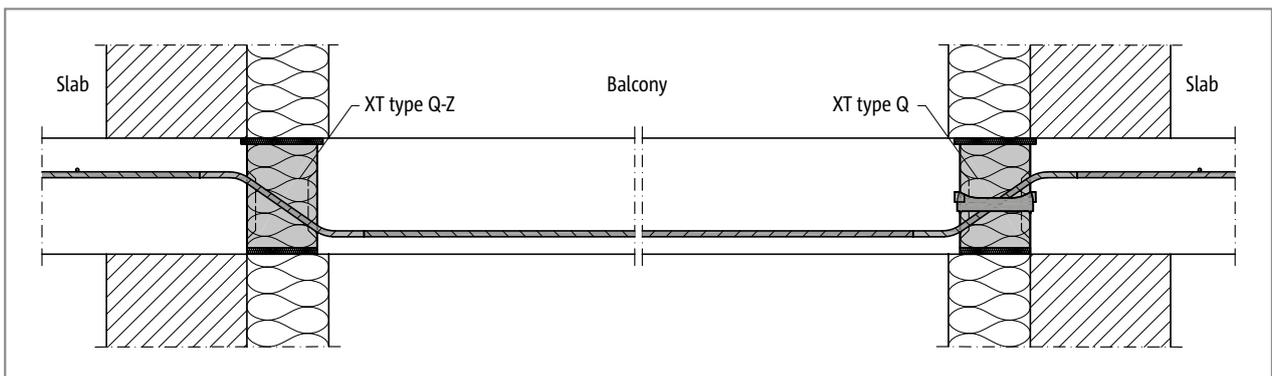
Schöck Isokorb® XT type Q, Q-Z: Application case single direction tensioned reinforced concrete slab
